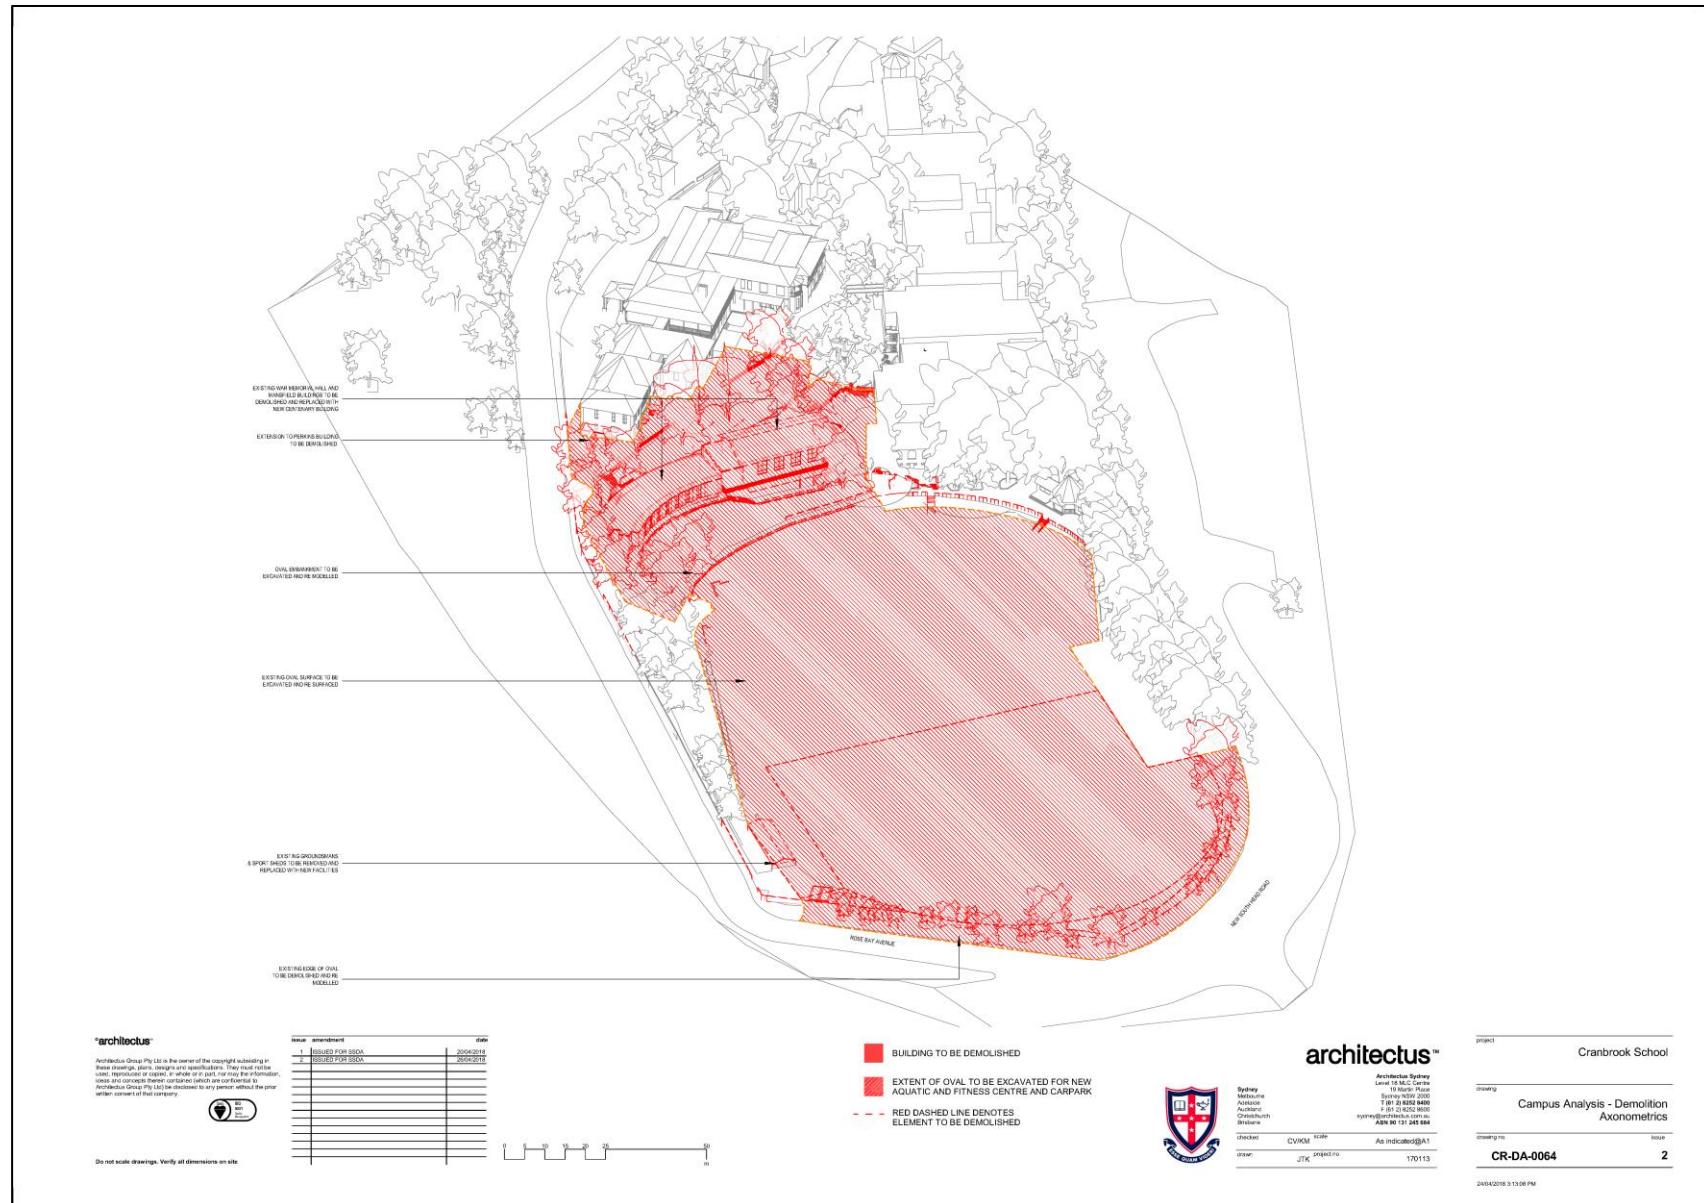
Showing the proposed demolition plan for Cranbrook (plan courtesy of architectus).
